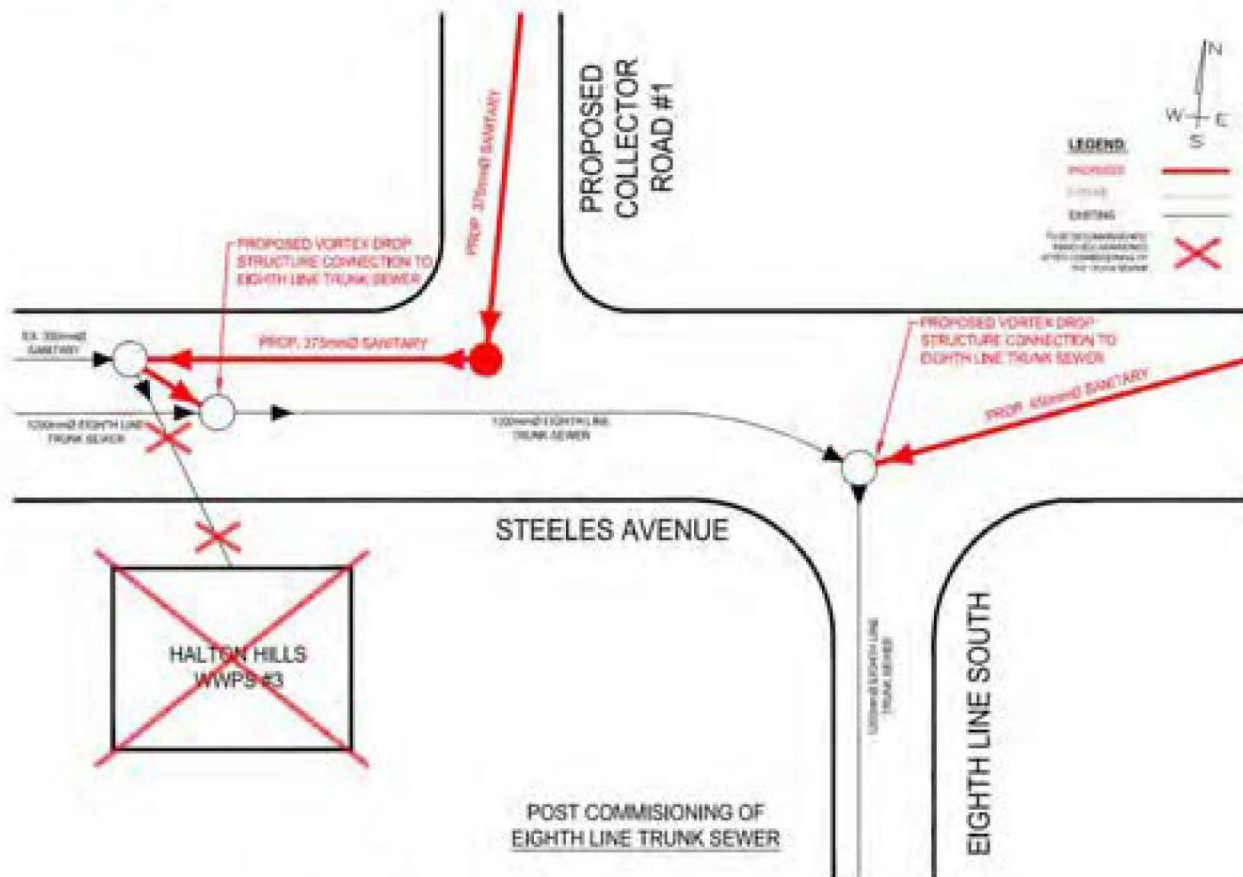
Proposed Outlet to Eighth Line Trunk Sewer
